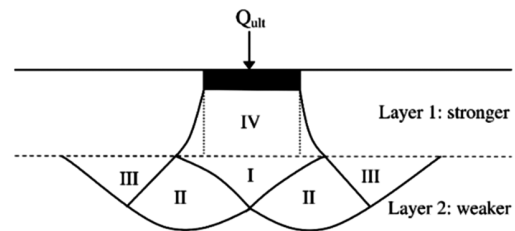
Failure mechanism of two layers soil underlying a strip footing<sup>29</sup>
